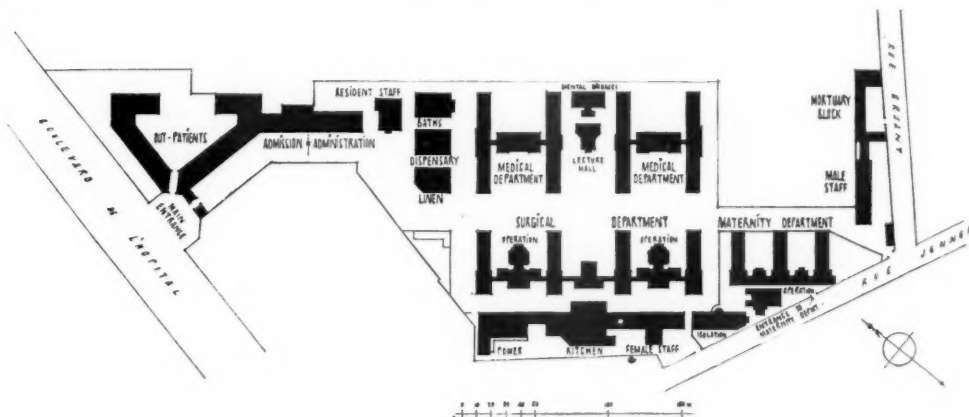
LA NOUVELLE PITIÉ HOSPITAL, PARIS: BLOCK PLAN. (Architect, M. W. Rochet.)
